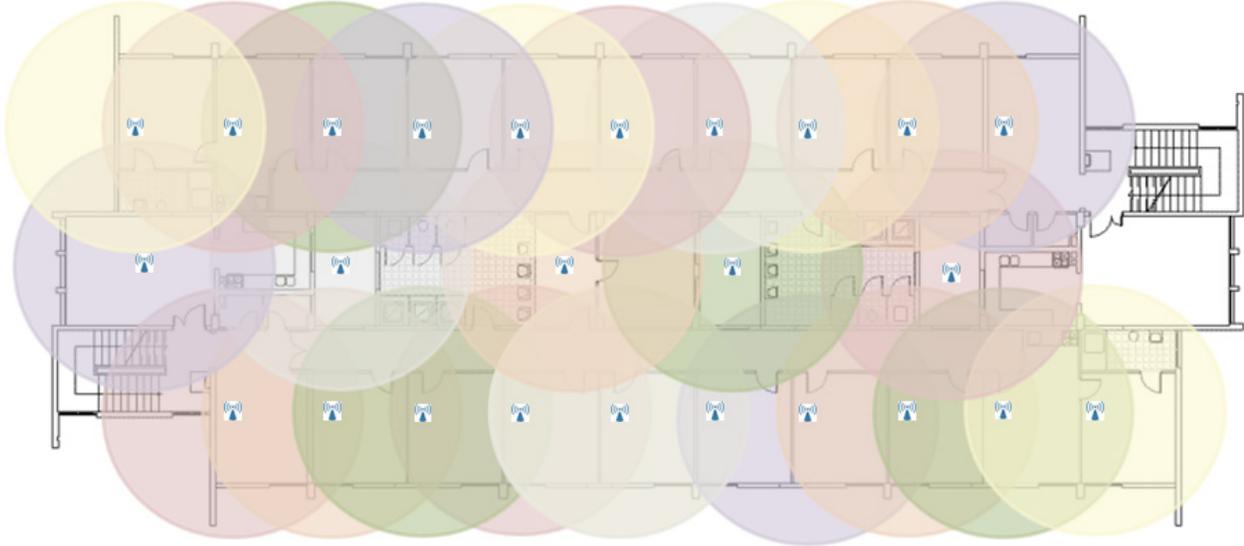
Dormitory AP Placement Plan and 5 GHz Channel Plan
